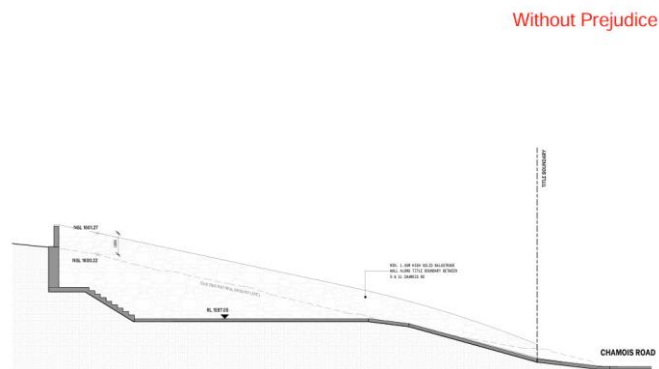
'Without prejudice plan', showing section of eastern side retaining wall – (Source: Applicant submitted on 30 March 2026)
